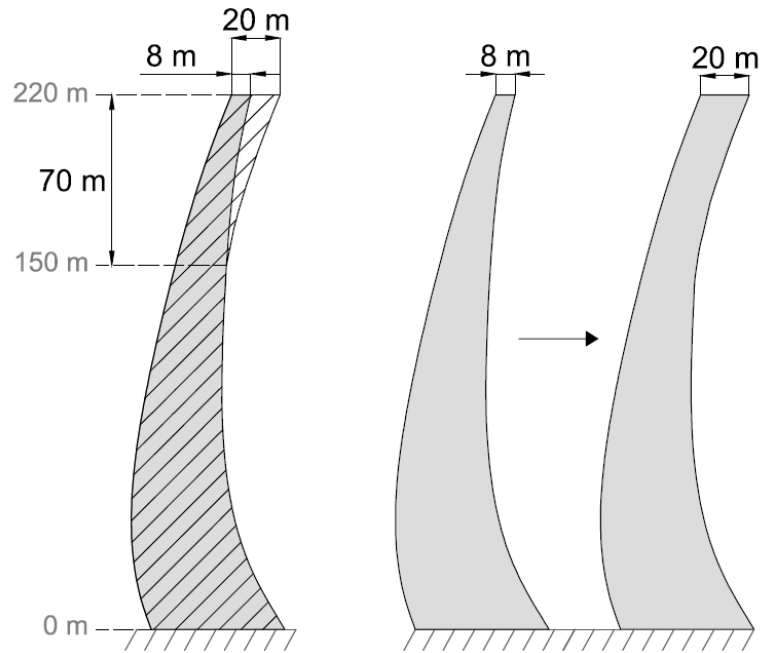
Cross section of the main section of the arch dam with an 8 m and 20 m crest width
